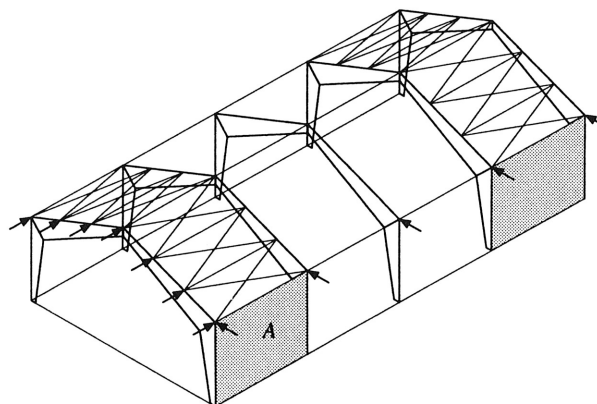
Combination of different types of bracing to horizontal forces in a industrial building.
